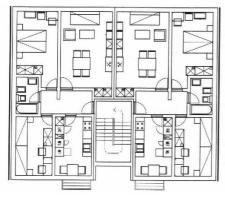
Position of the staircase and typical building's floor in the 50's and 60's.
